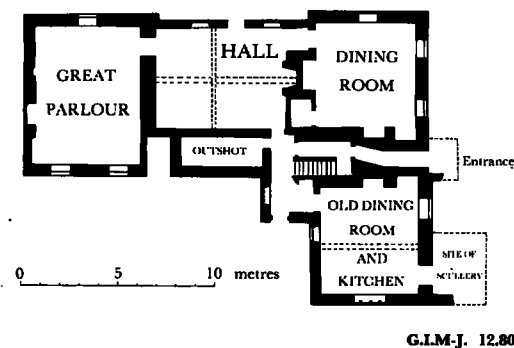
The Wakes: the ground floor plan of the late eighteenth-century house.
